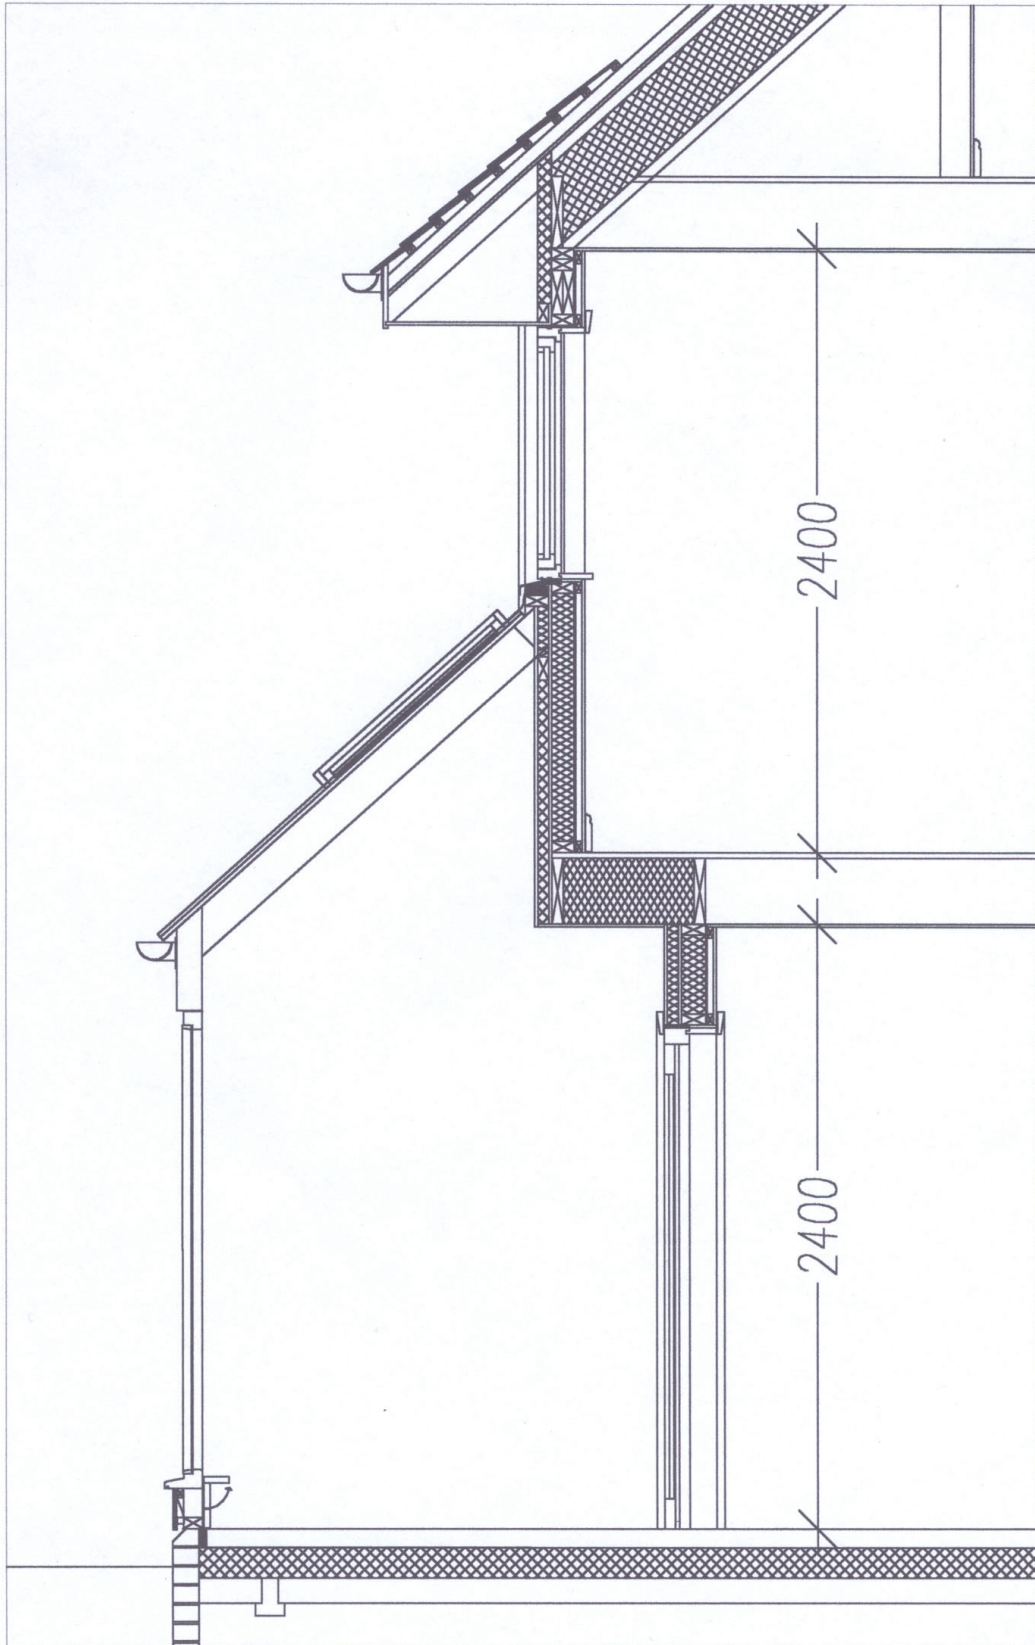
Construction section through 3-bed 5-person house at St Nicholas Court.
